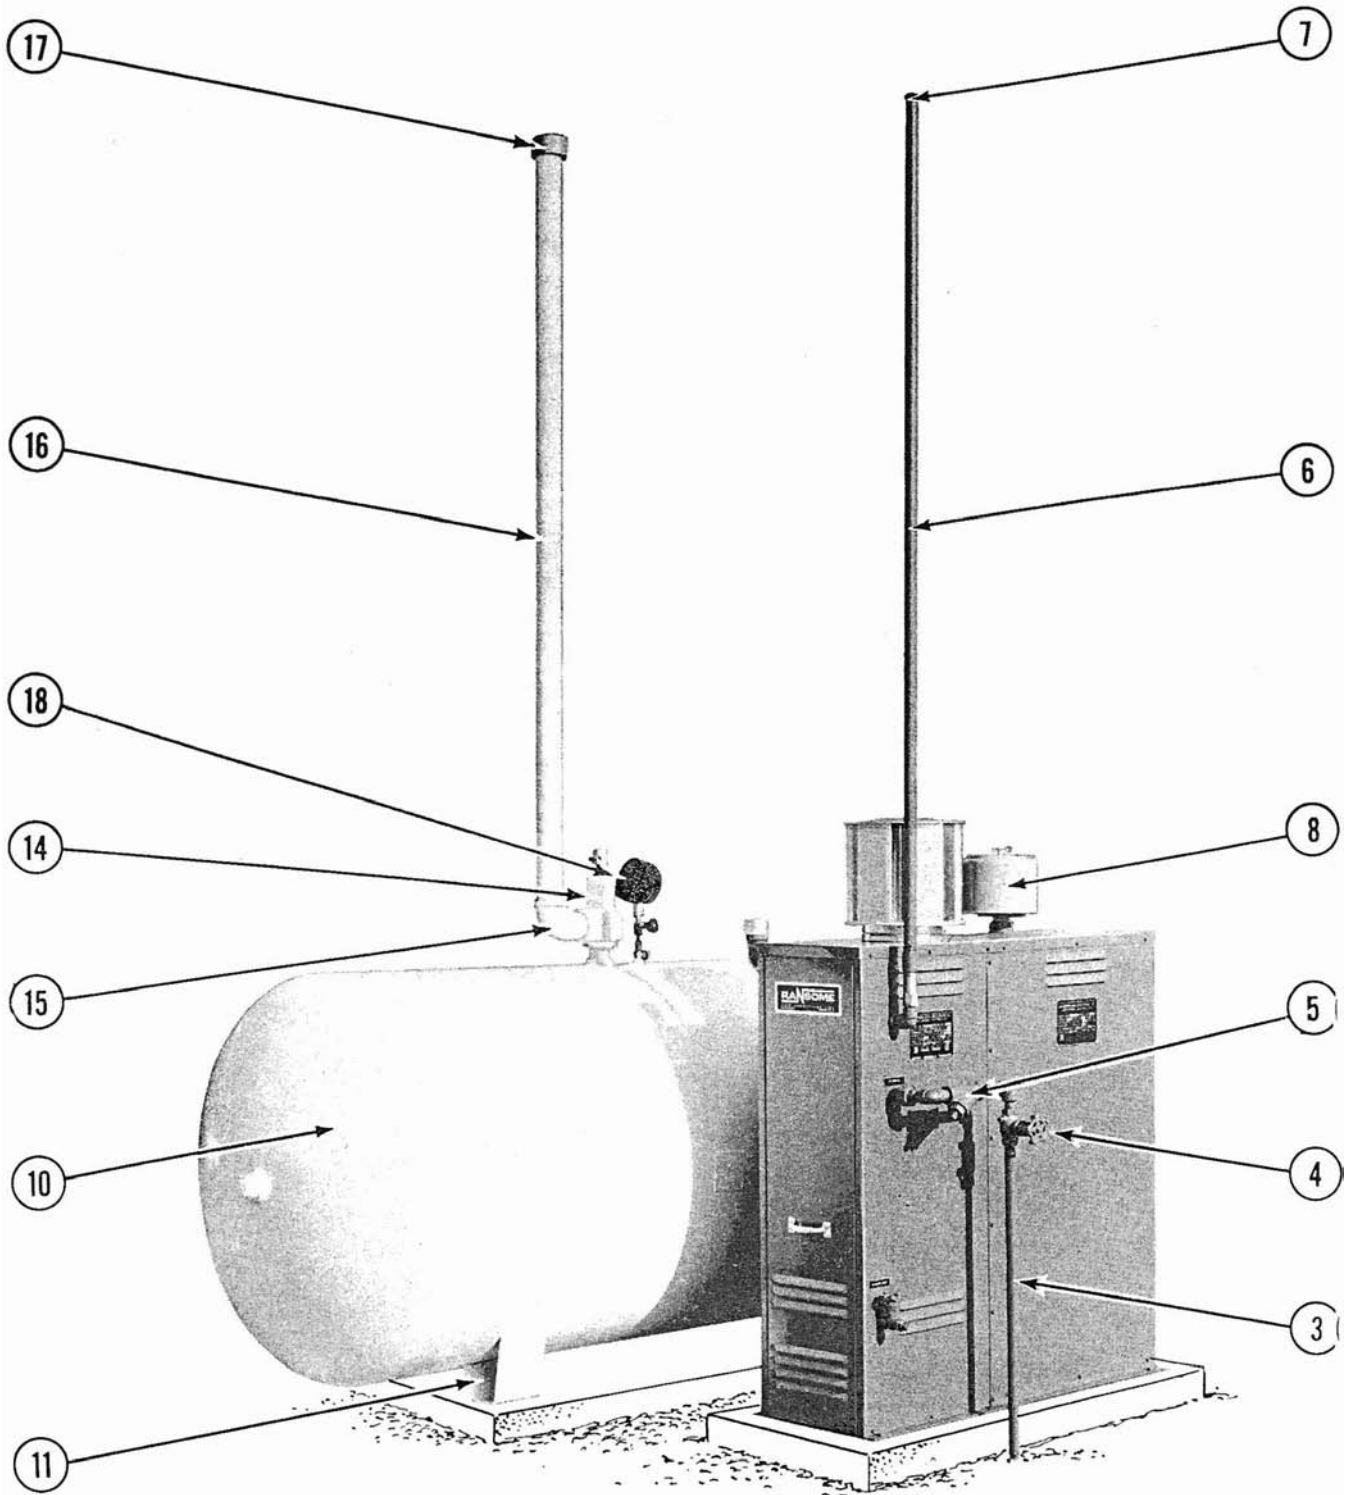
PAMW 100-6 Installation – Typical for -6
